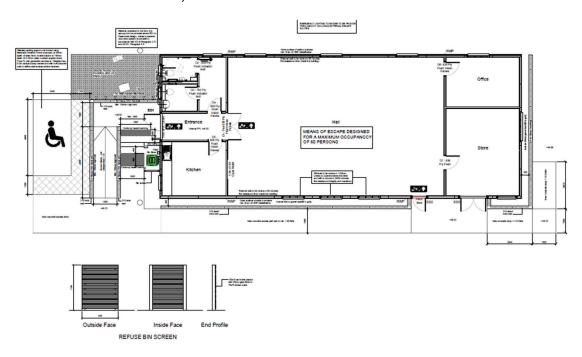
Proposed Site Layout Plan (please note – larger version of plan can be found in the Committee Plan Pack)
